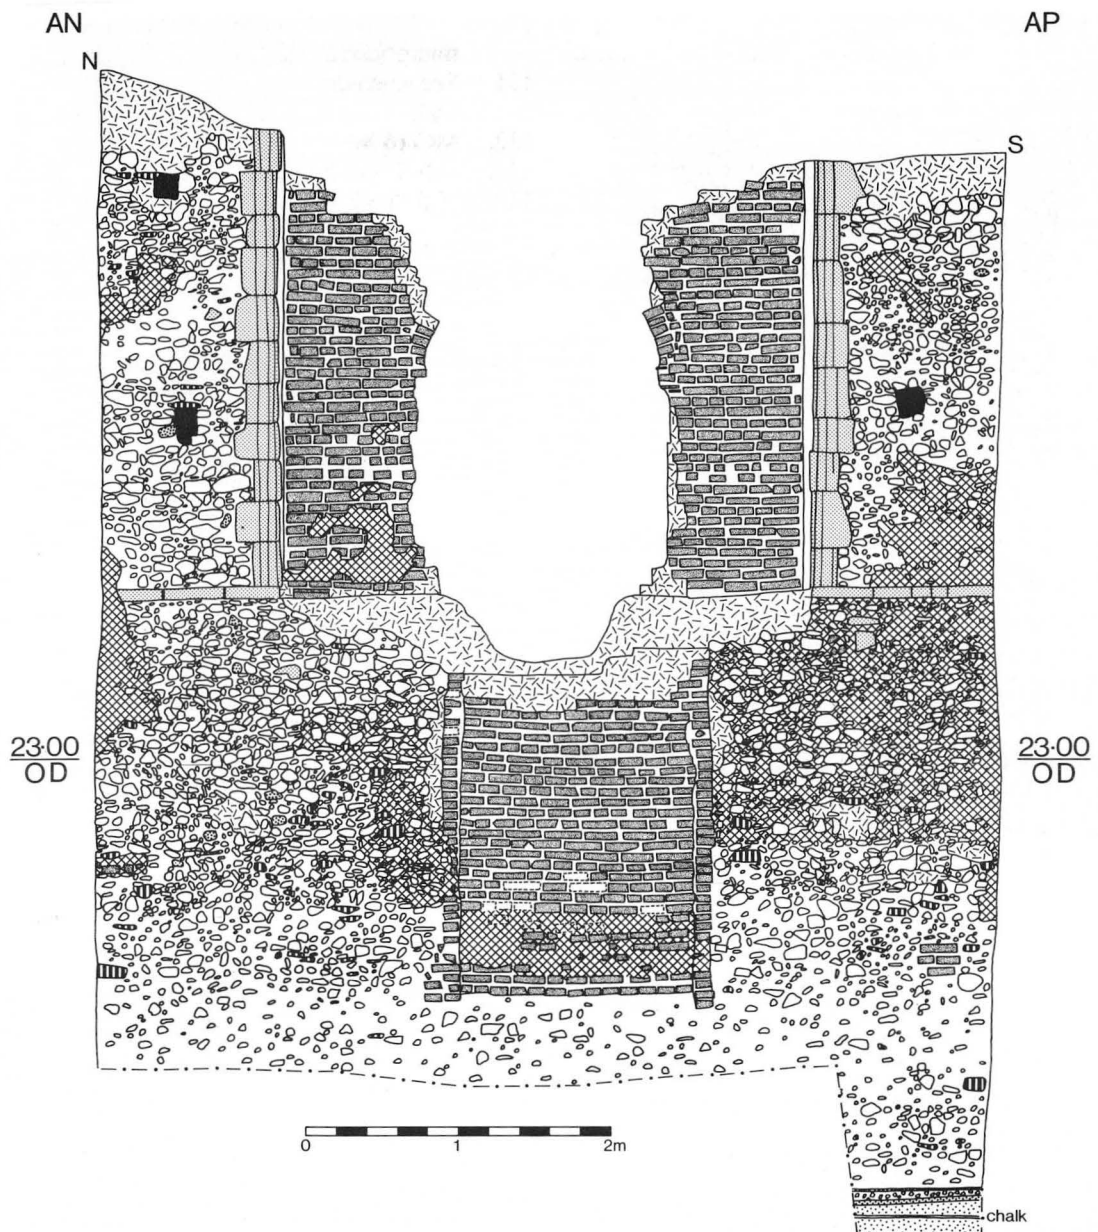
Elevation AN-AP of interior east wall of the chancel. Scale 1:50
